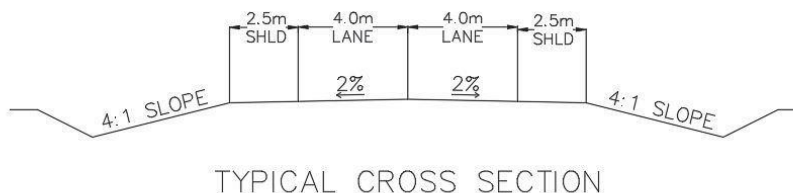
Desirable Typical Cross-Section for "Last Mile" (NWMO, 2021)
